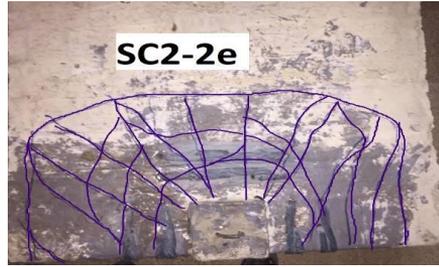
Pattern of cracking for specimen (SC2-2e).
